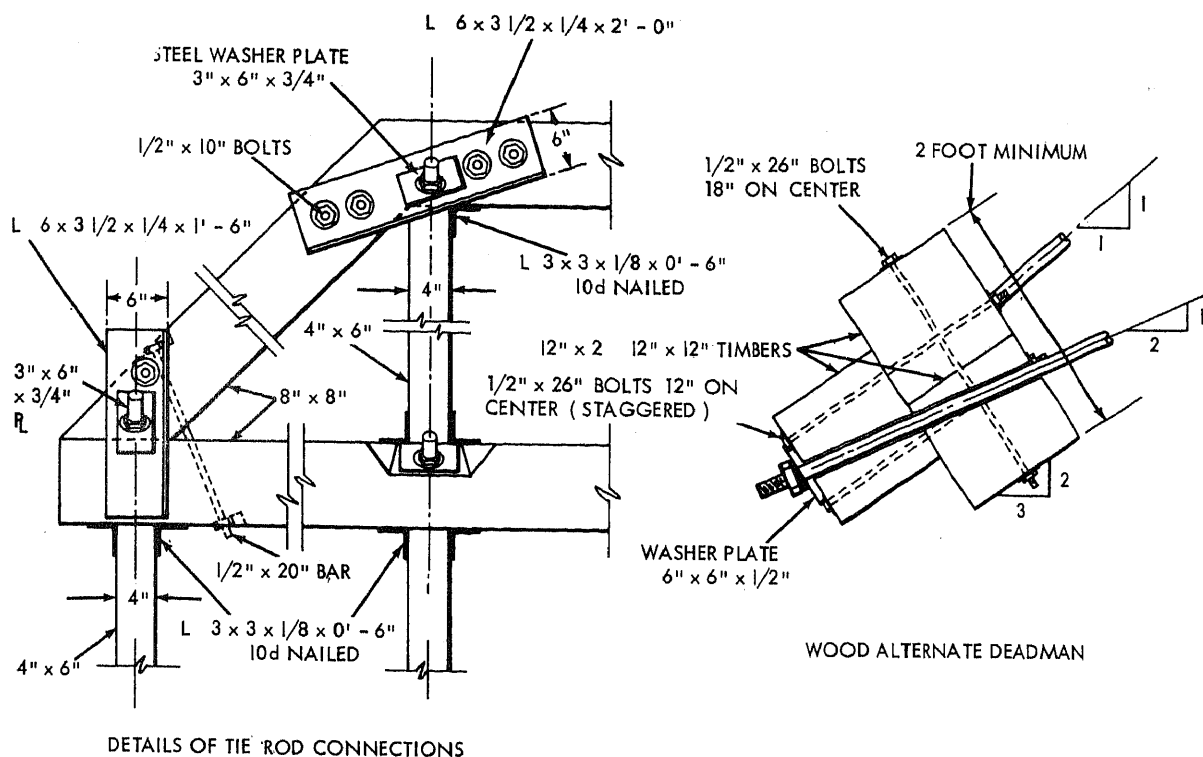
Connection details of timber-framed, corrugated steel endwall suitable for 50 psi. Shown with 15-foot-radius structure.
